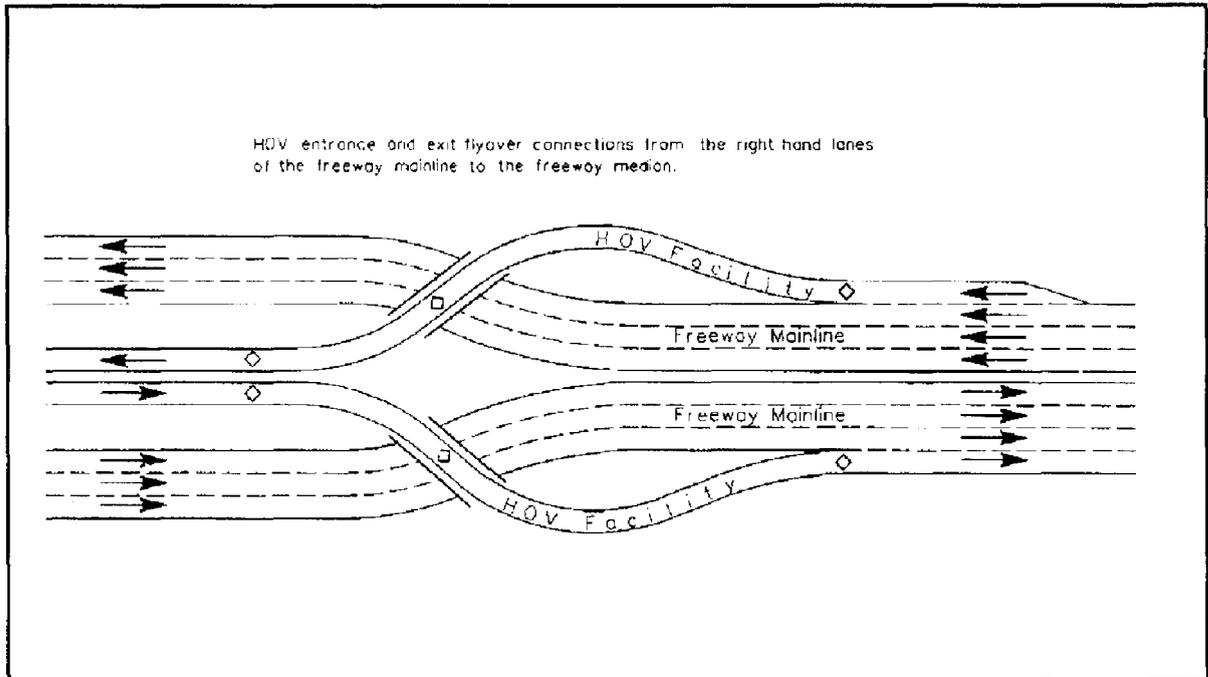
Terminal Flyover Connection to Freeway Mainline.⁽¹⁰⁾
